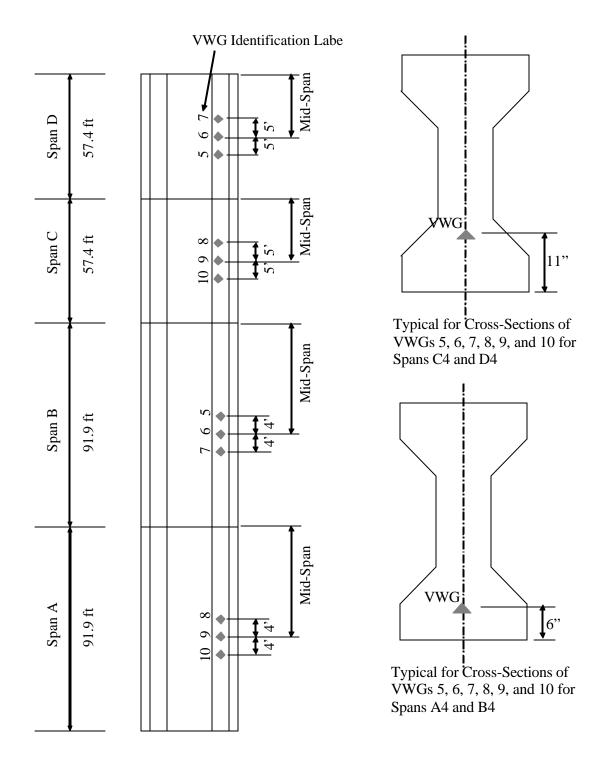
Retained Vibrating Wire Gauge Locations In The Girders Along The Entire Span Length Of Girder-line 4 And The VWG Cross-Sectional Placement at Those Locations
